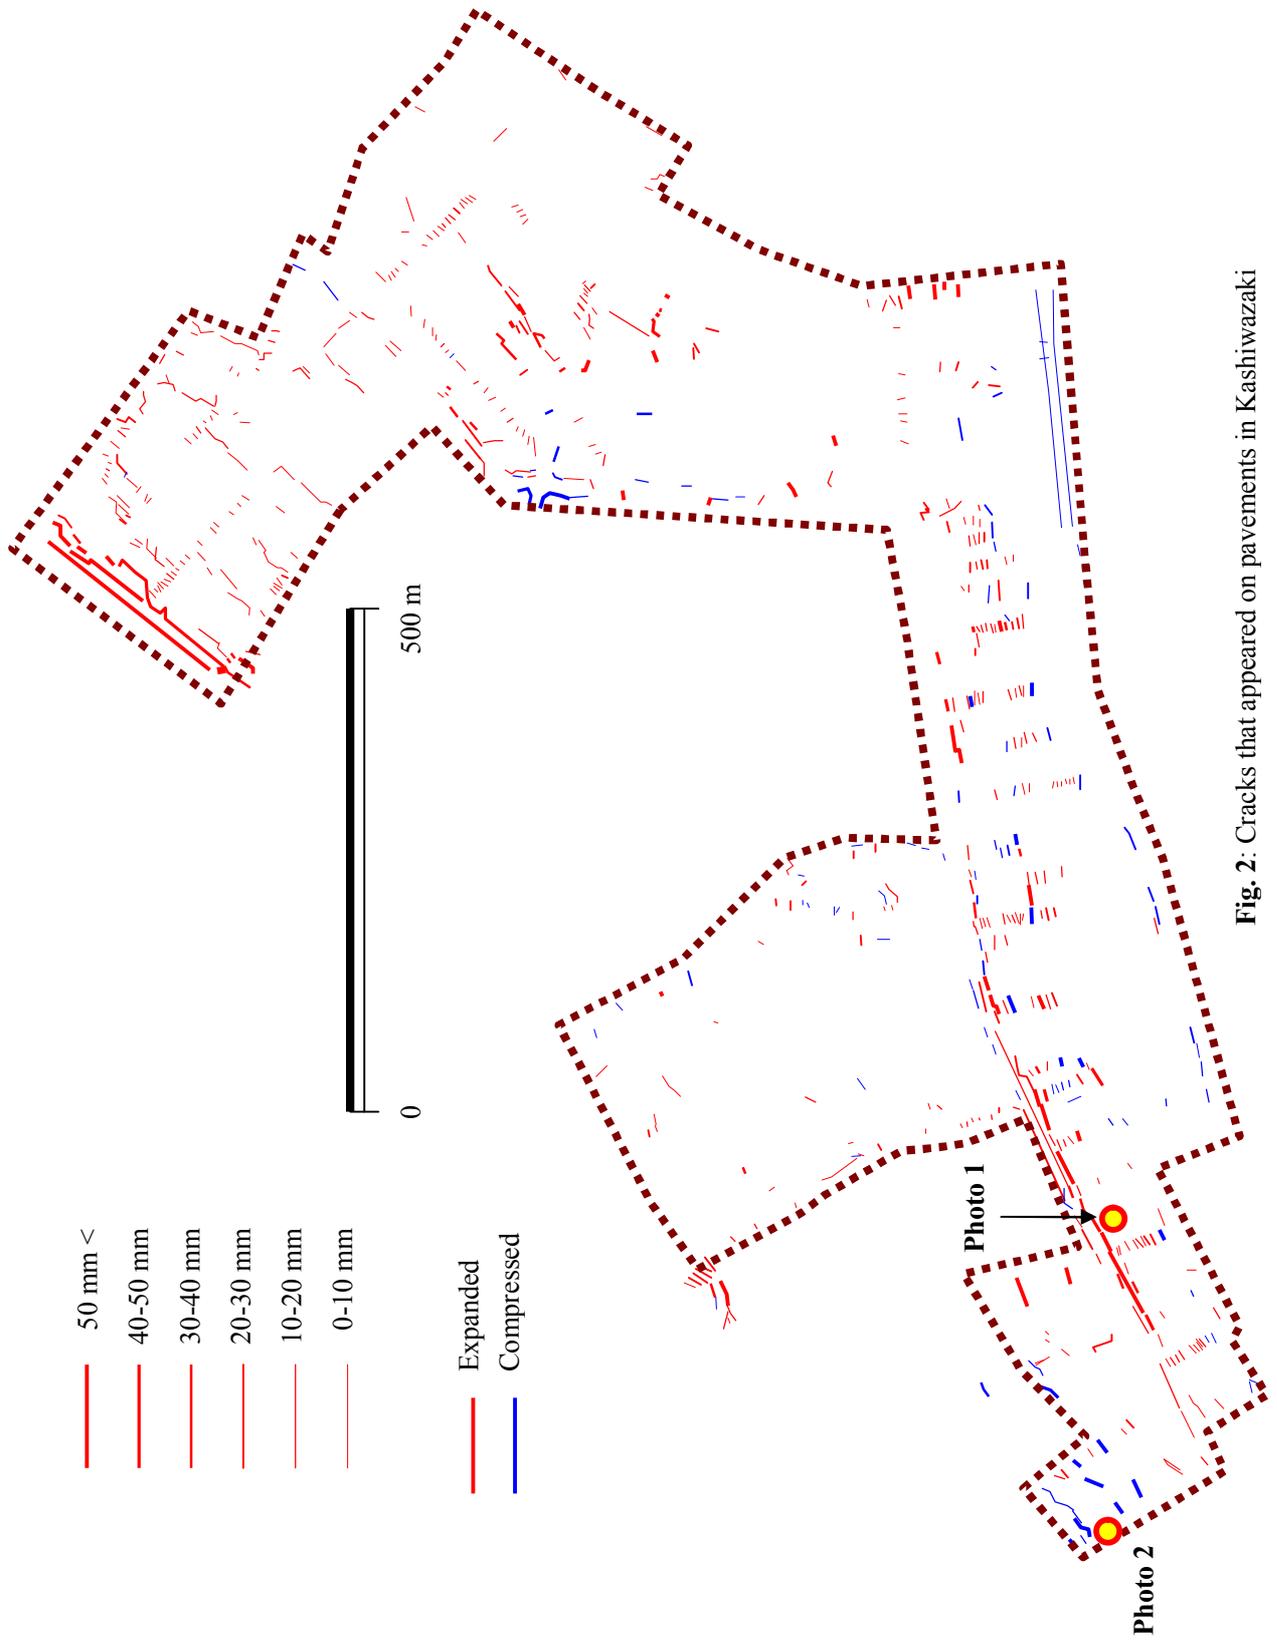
Cracks that appeared on pavements in Kashiwazaki
